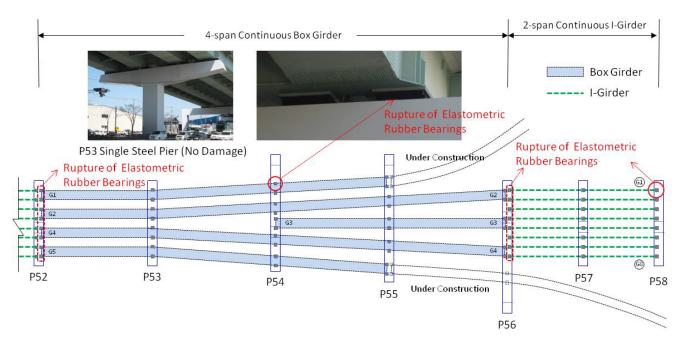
Bridge Structure of Sendai-Tobu Viaduct and Position of Elastometric Rubber Bearing with Rupture
